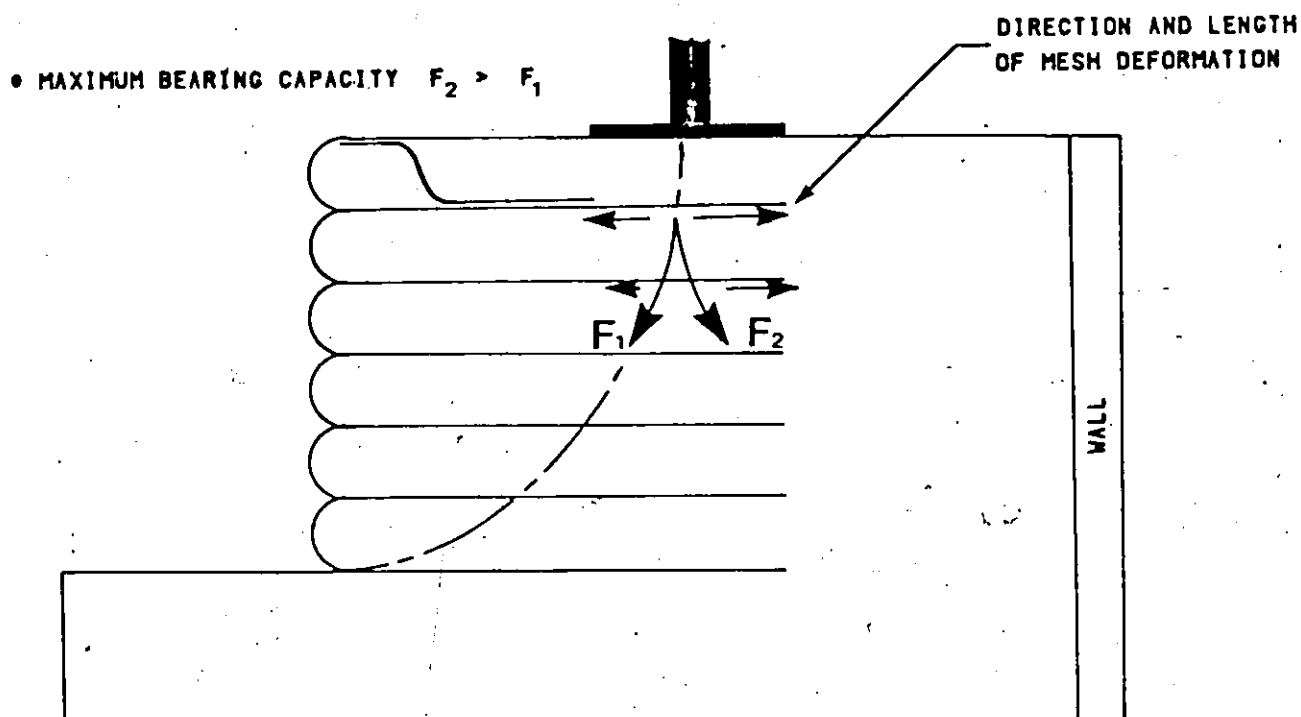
FAILURE SURFACE FOR REINFORCED WALL W-4
